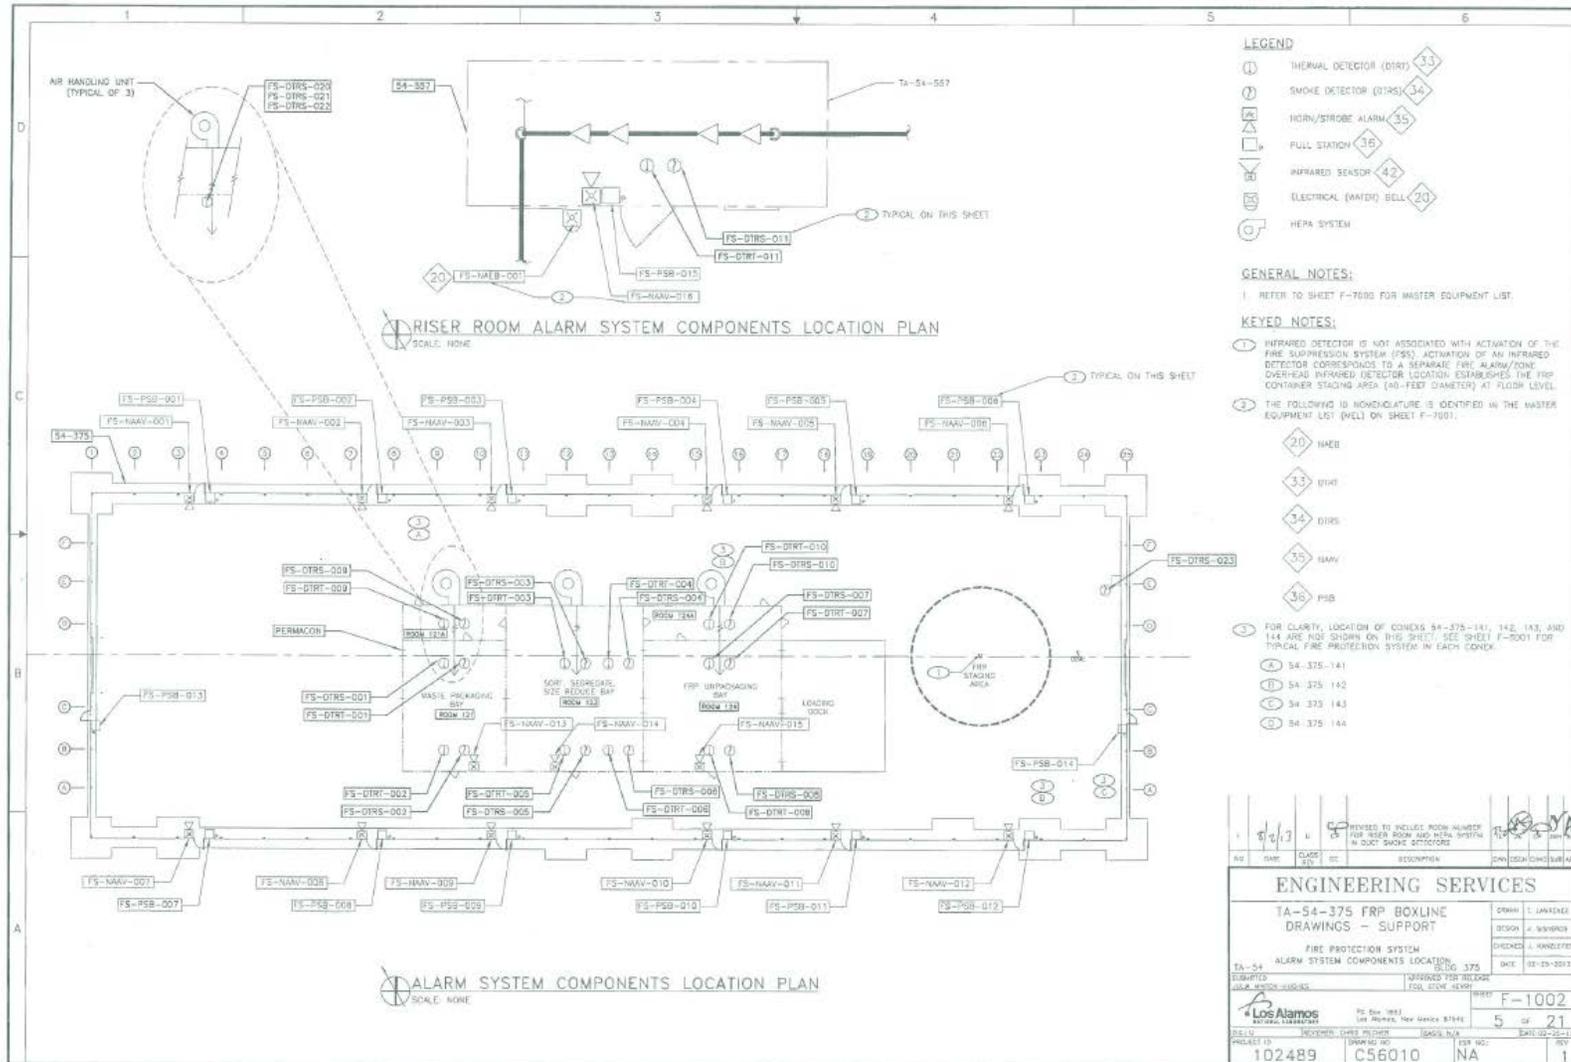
, TA-54-375 PermaCon Alarm System Component Location Plan
